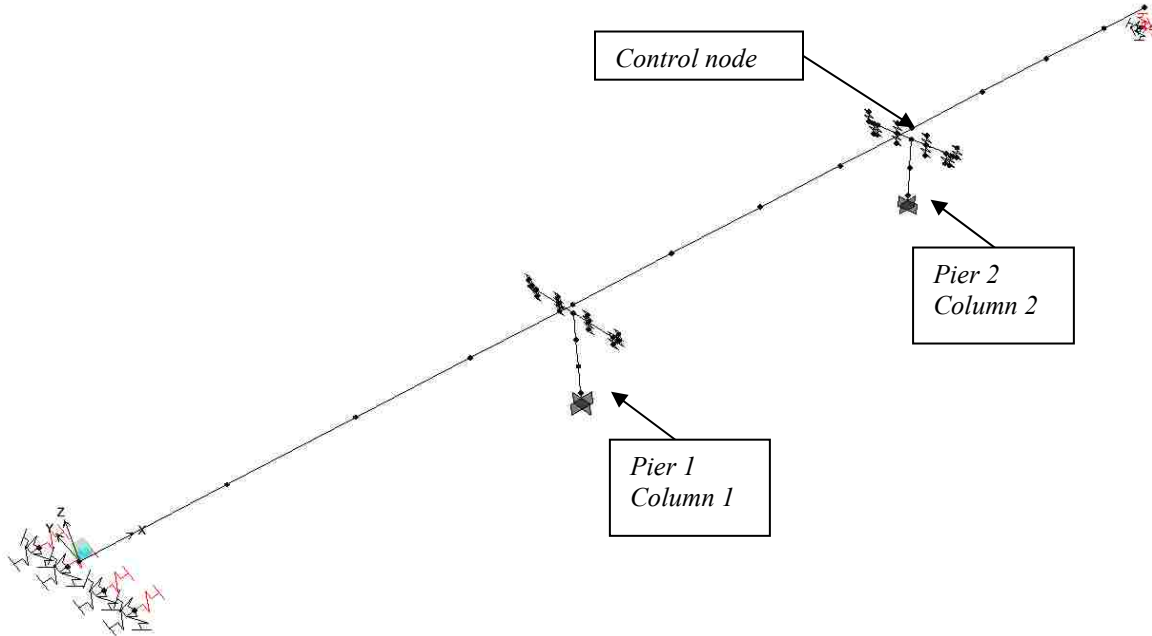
Bridge I-2139 - Structural model for both transverse and longitudinal direction
